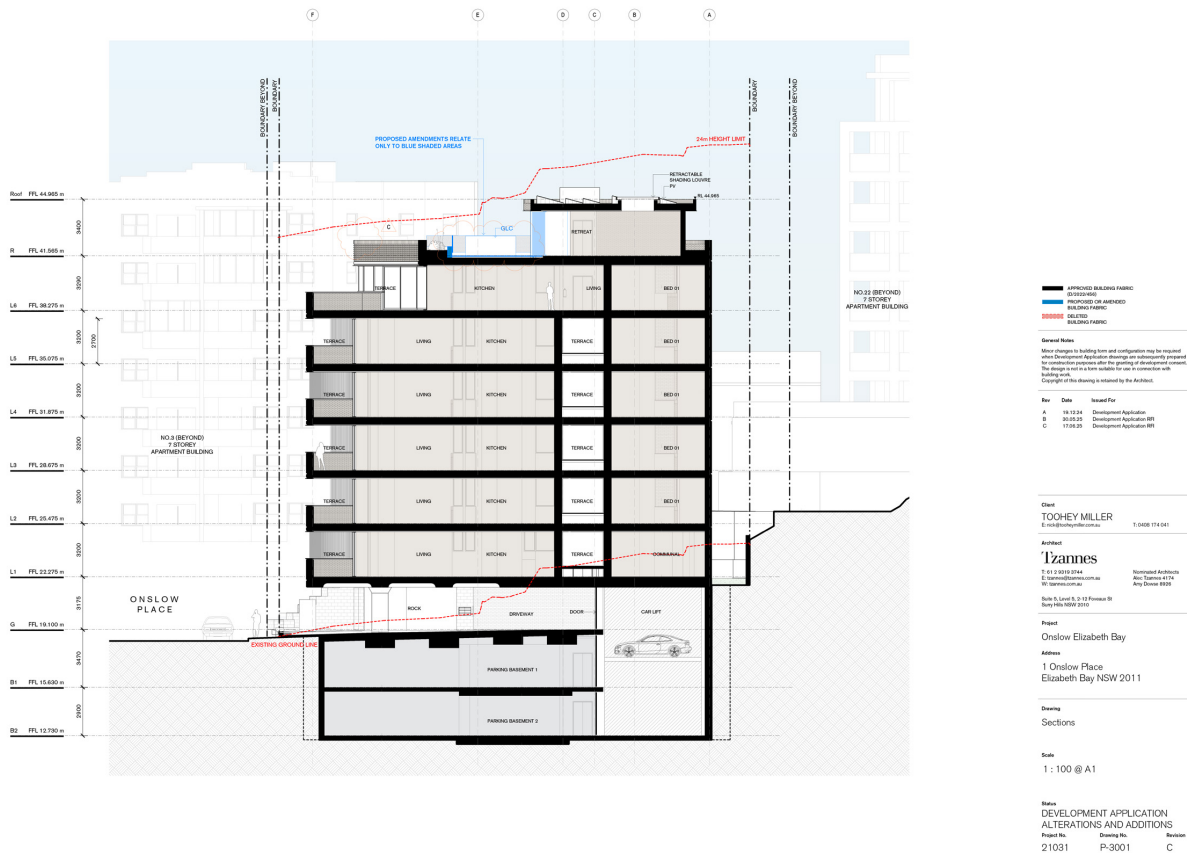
Typical sections through the proposal. Tzannes Architects.
